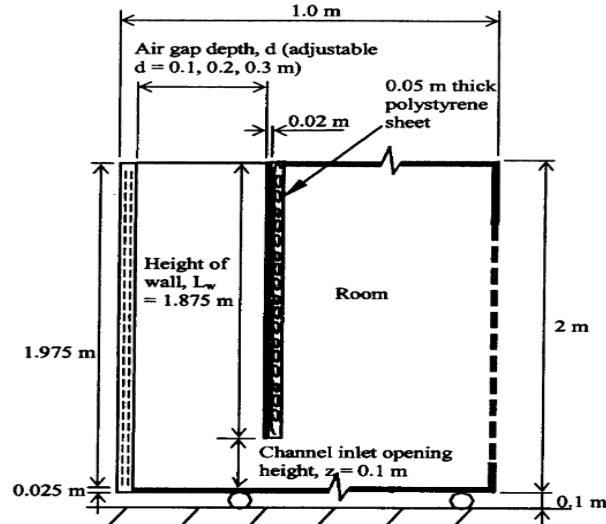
The cross-sectional view of wall-type solar chimney [20]
